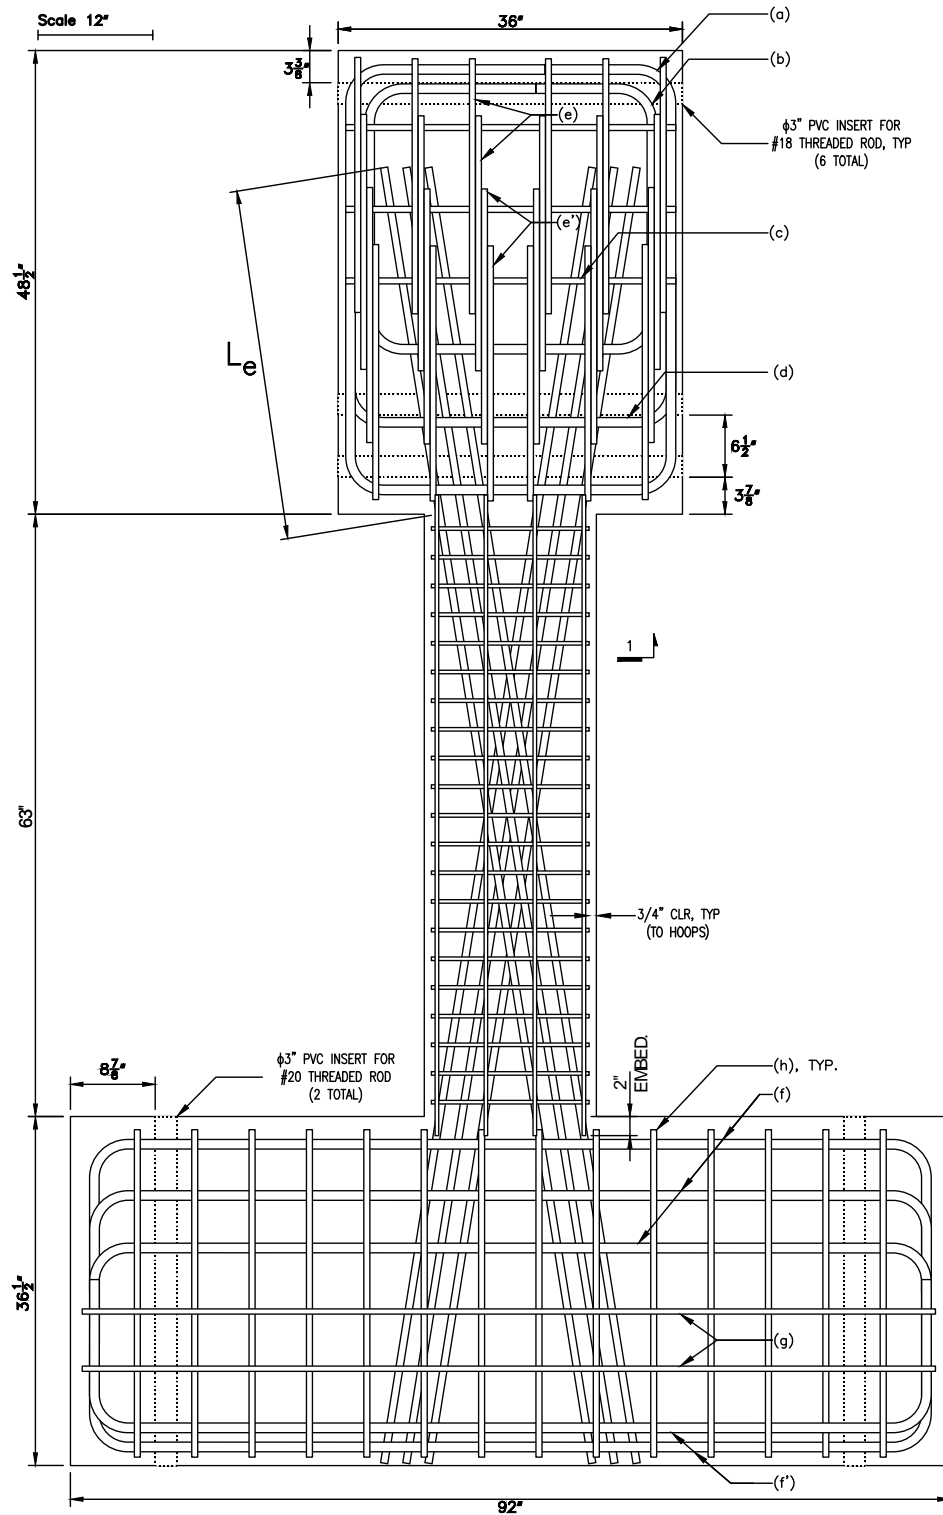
Elevation view of D120-3.5 (1 in. = 25.4 mm)
